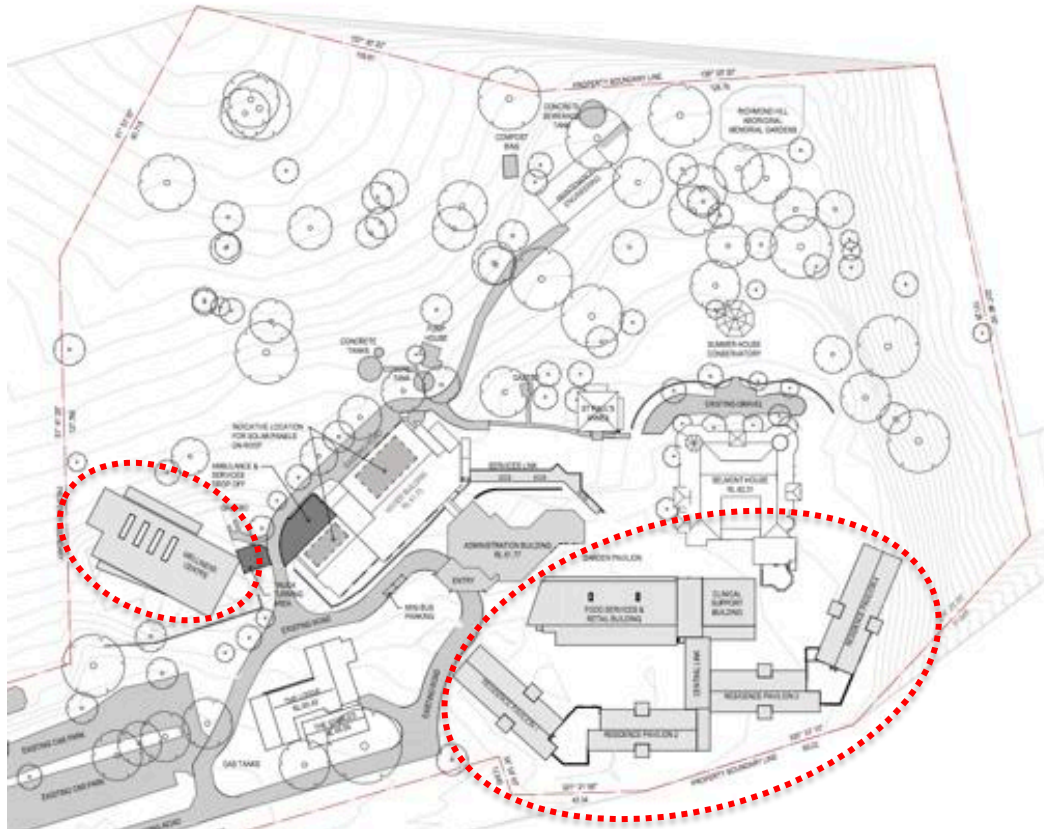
Proposed Site Plan. Silver Thomas Hanley. 2020. Proposed new buildings are outlined in red.
